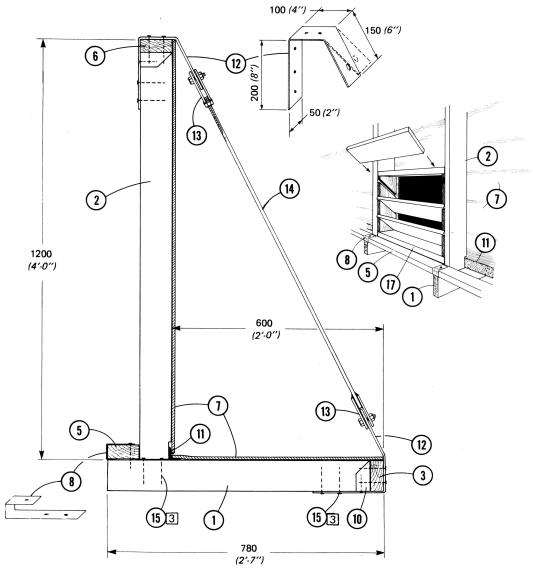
Section showing connections between floor and wall parts Grain pressure on the 'floor' part holds each panel in place. When panels are first set up, it is helpful to brace them temporarily with pieces of wood tacked to the wall and floor.
